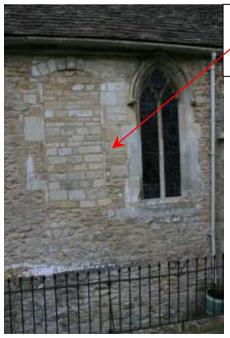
detail of 19th C blocked window/balcony entrance on the south wall of the nave.
